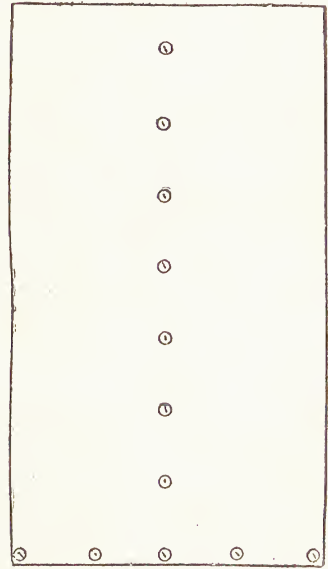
Method recommended for nailing "Sundeala" sheets. Nail in centre first.
